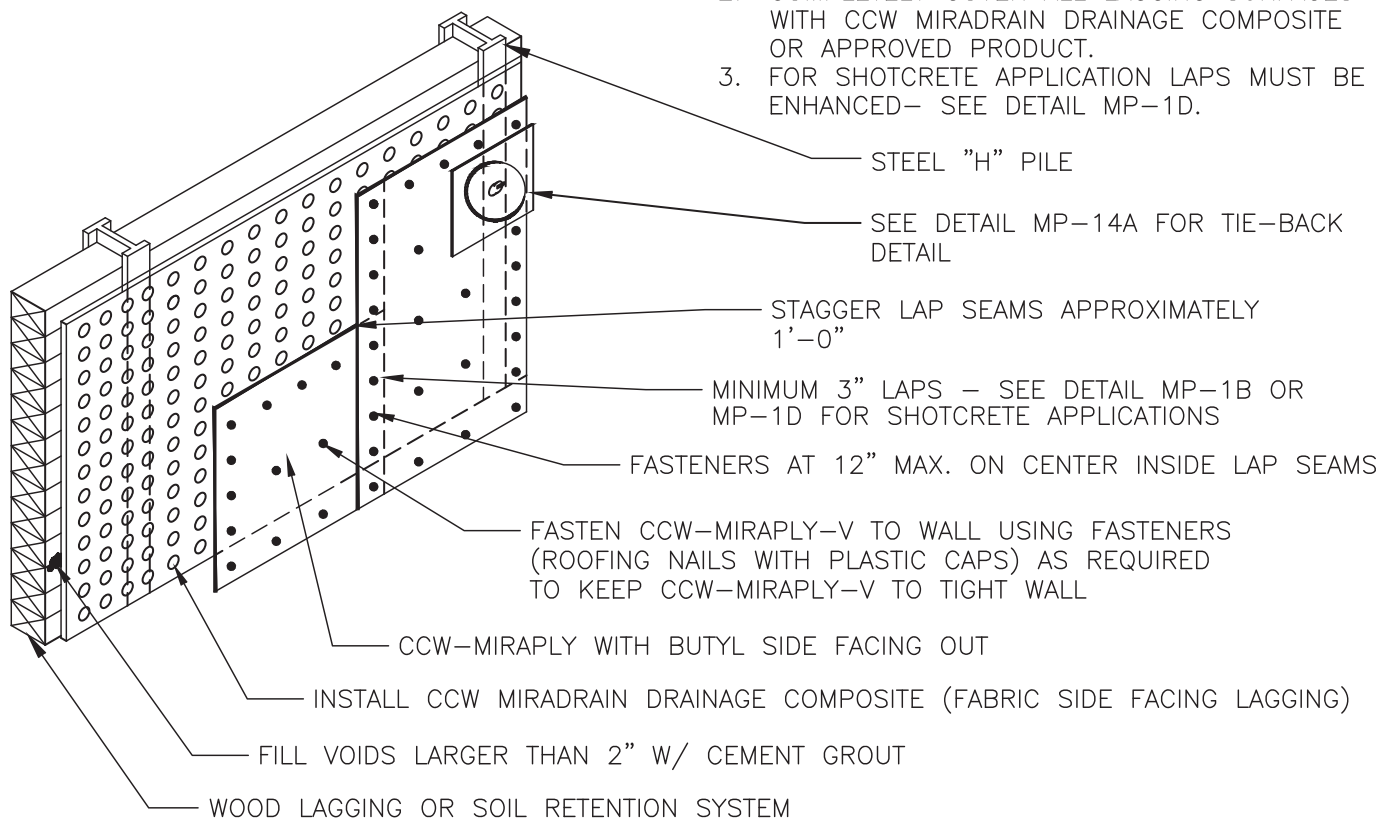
DETAIL IS INTENDED TO BE A GUIDE FOR WATERPROOFING INSTALLATION ONLY.
